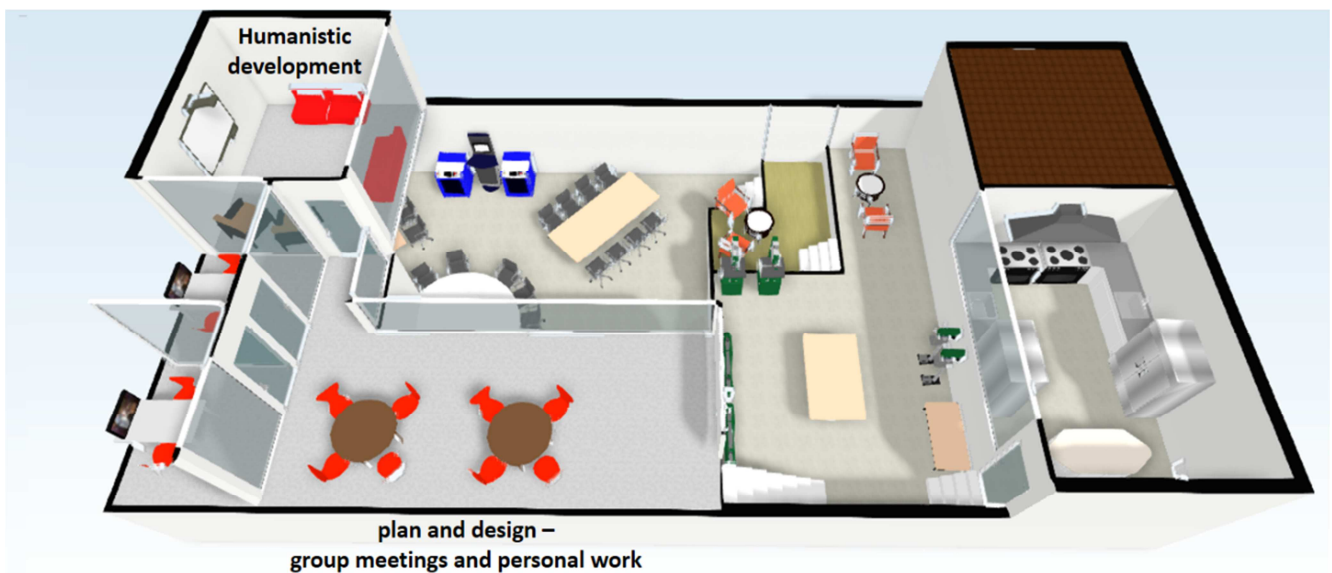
Initial sketch of the Innovation Center and its working spaces – first floor.
